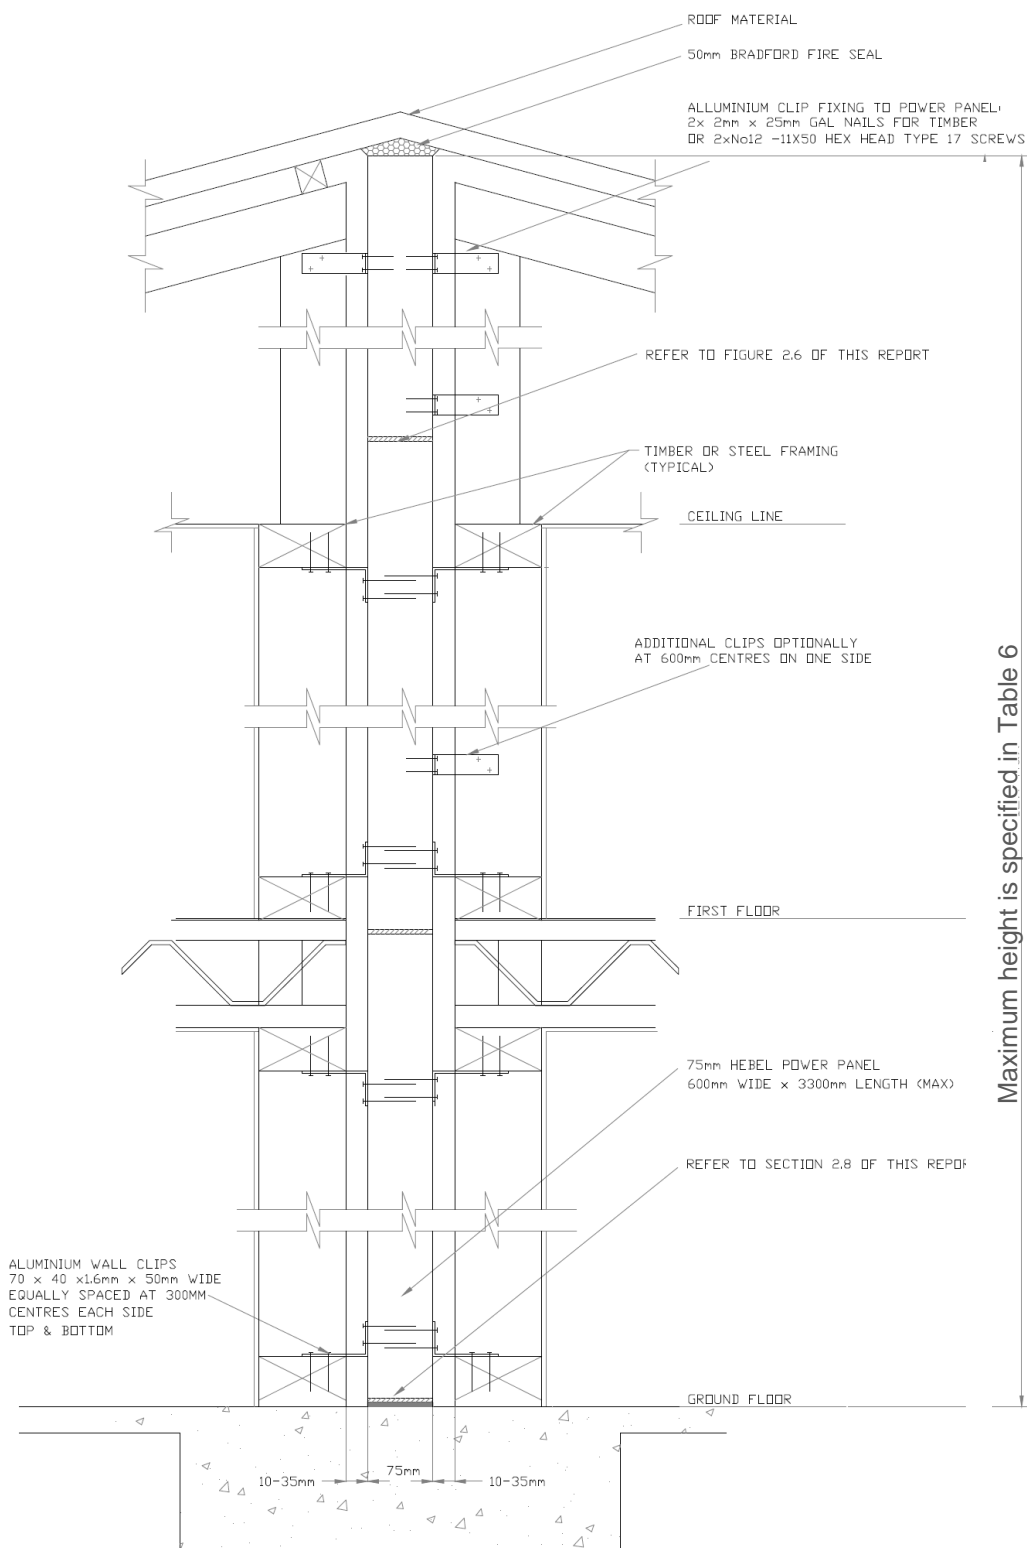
Typical elevation of 75 mm PowerPanel CSR partywall systems with aluminium clips
